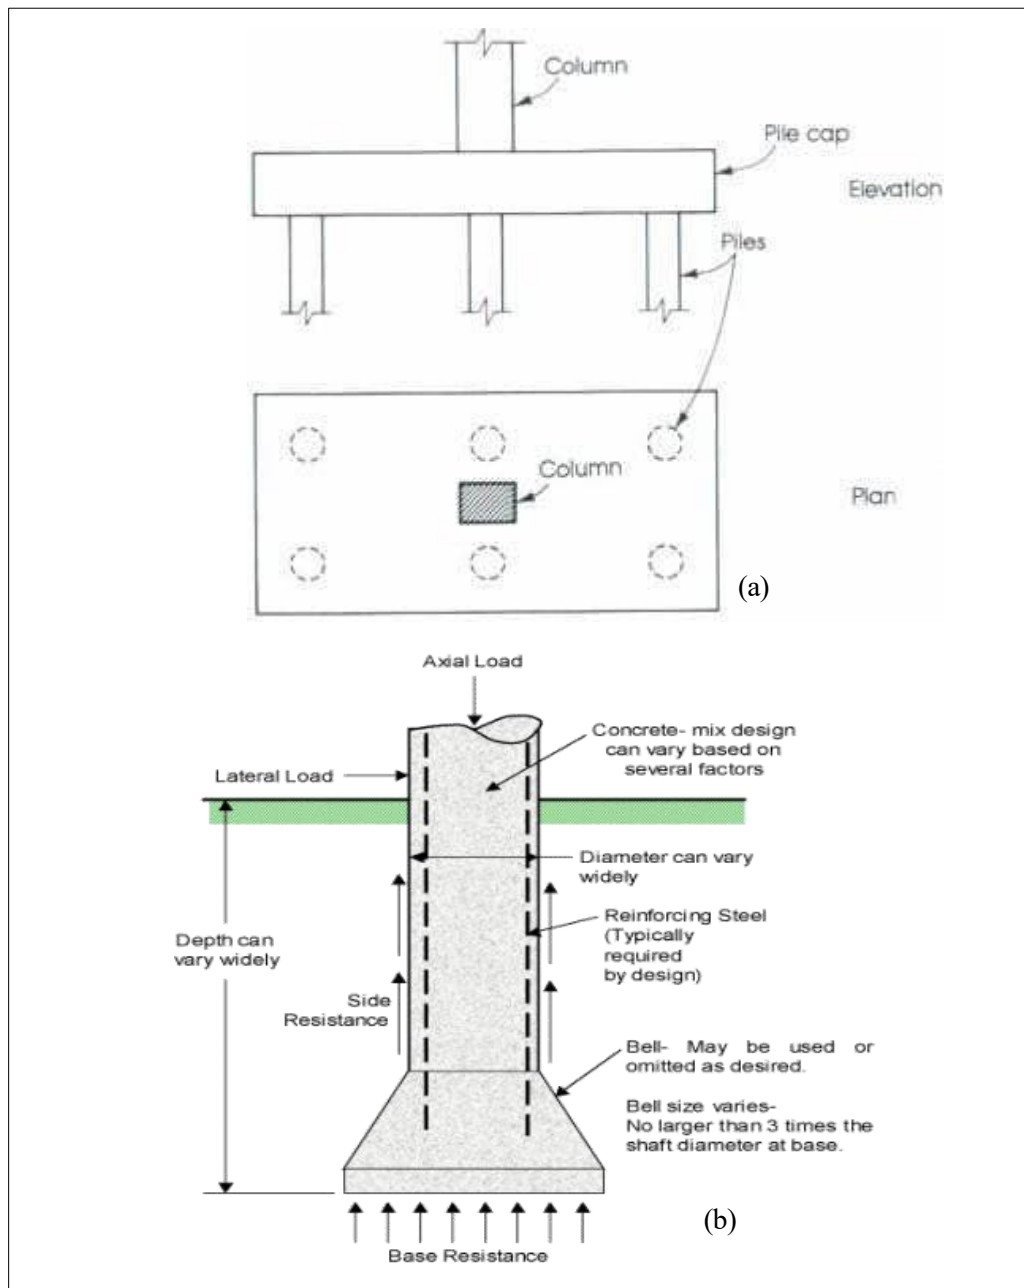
Deep foundation, (a) Pile Foundations, (b) Caisson Foundations²⁰
